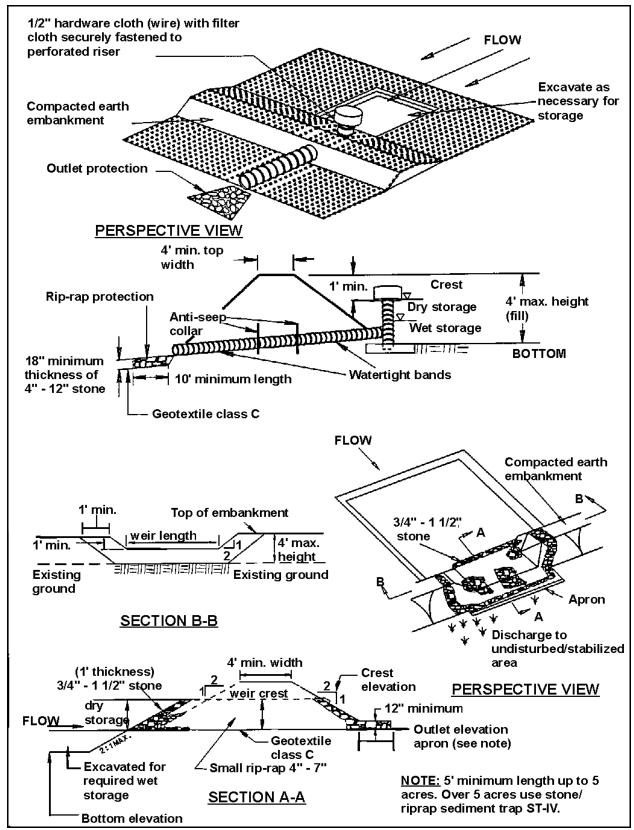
Examples of pipe and stone outlet sediment traps (Maryland Department of the Environment, 1994).
